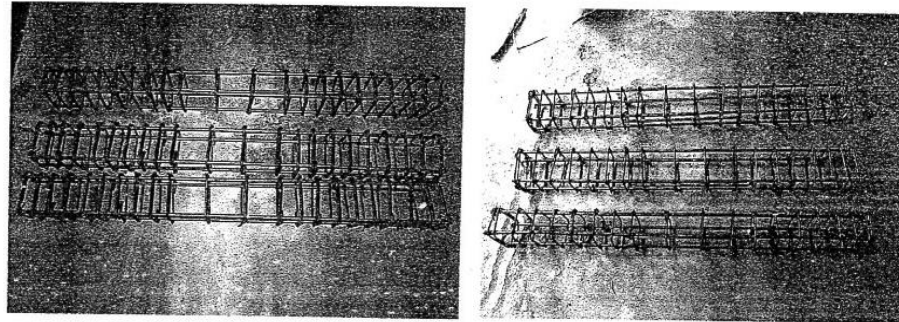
Bending Beam Test Material Object with 2 and 3 Tensile Reinforcements
